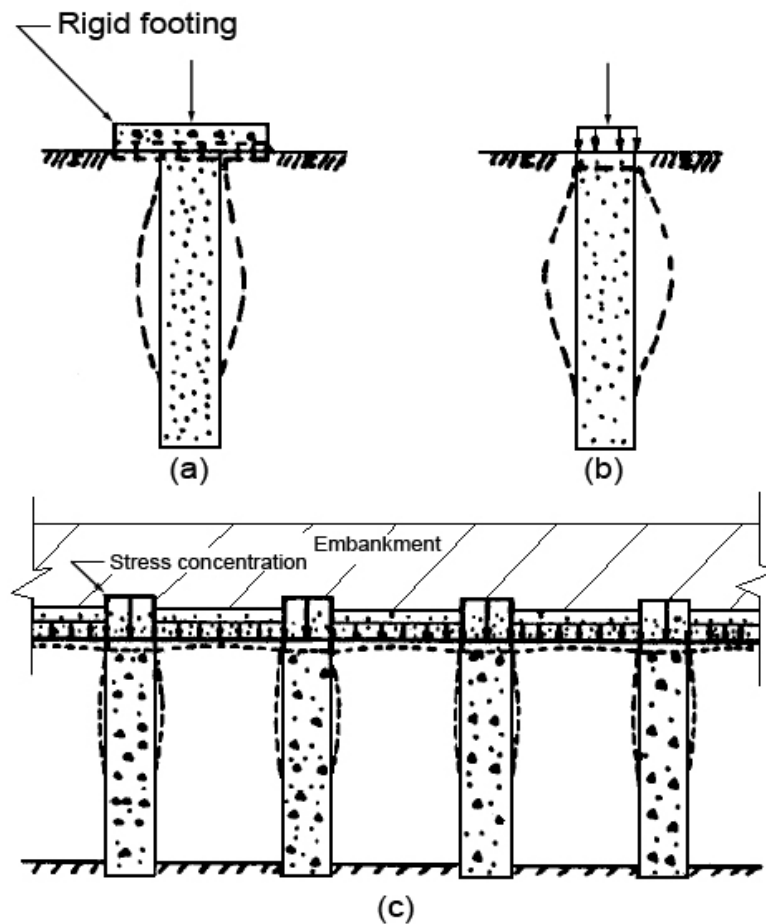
Different loading types applied to columns: (a) Rigid footing loading, (b) Plate load test, (c) Embankment loading (Barksdale and Bachus, 1983)
